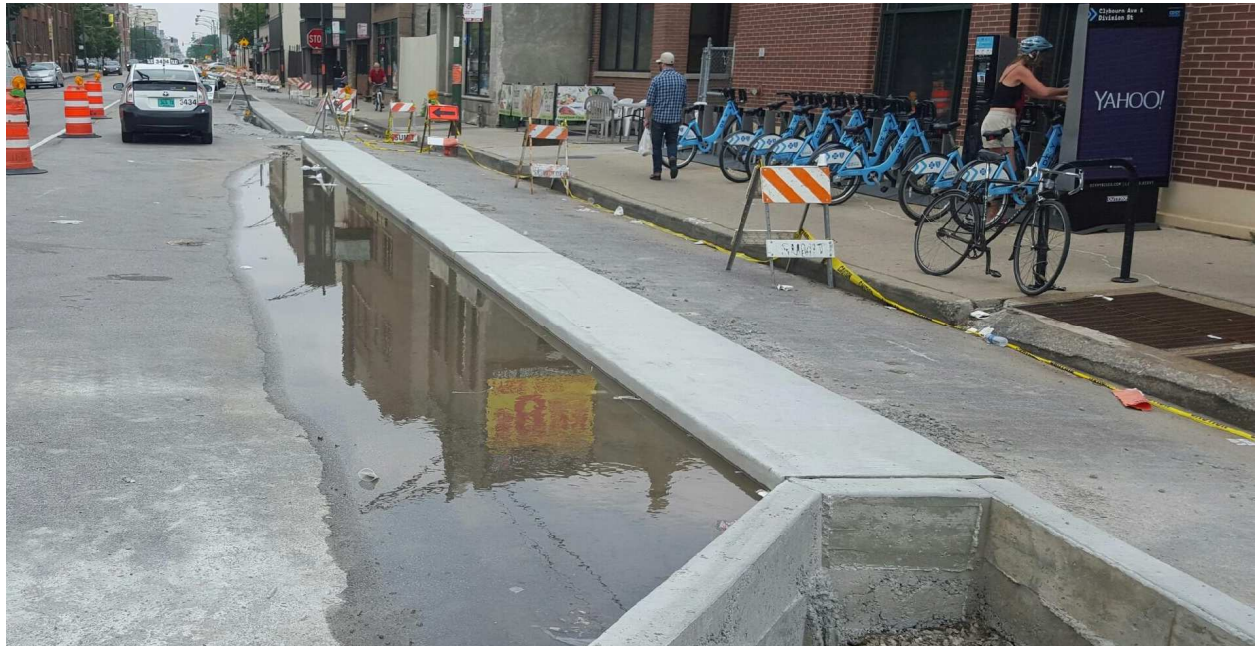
Ponding in a parking lane adjacent to a curb separated bicycle lane under construction in Chicago
